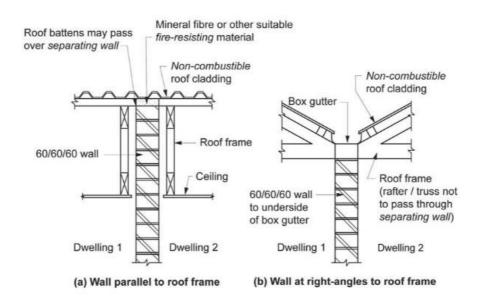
Separating wall construction—Underside of non-combustible roof cladding
